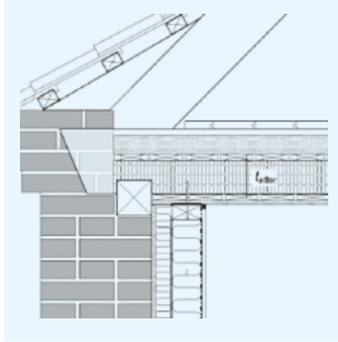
Vertical section of the joint between the bases of the roof at the load-bearing exterior wall
